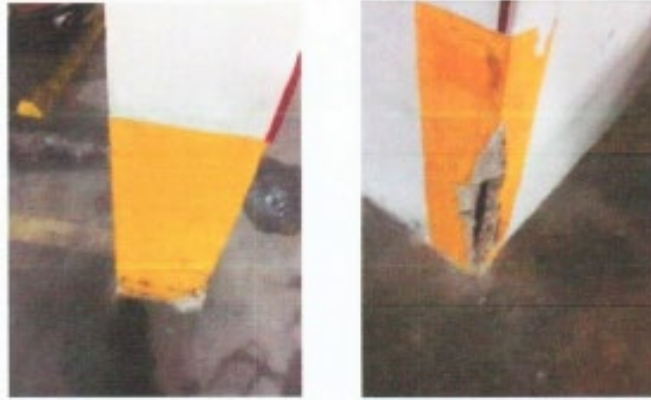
Typical cracking and spalling at parking garage columns
